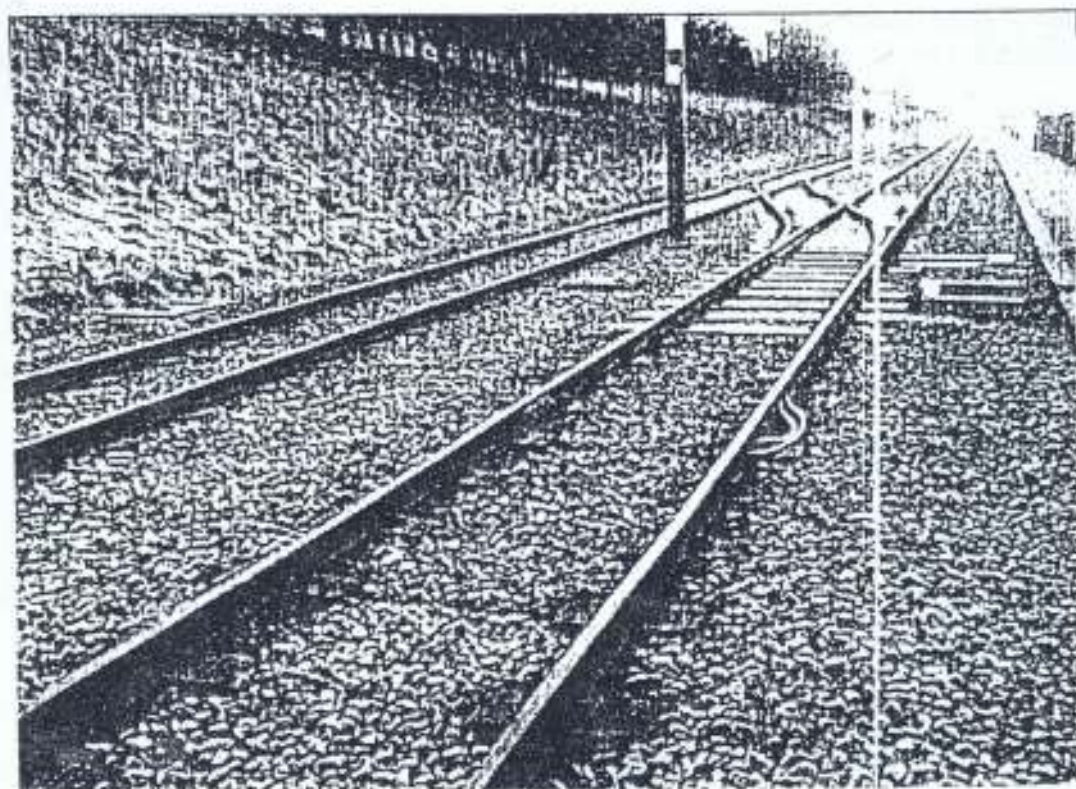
Mixed concrete and wooden sleepers used on the Sheffield supertram LRT system. The concrete sleepers are of the twin block type. Note that the steel bar connecting the two blocks is normally covered by the ballast. Wooden sleepers are used for the crossover because the timber is easy to cut to the required size.
